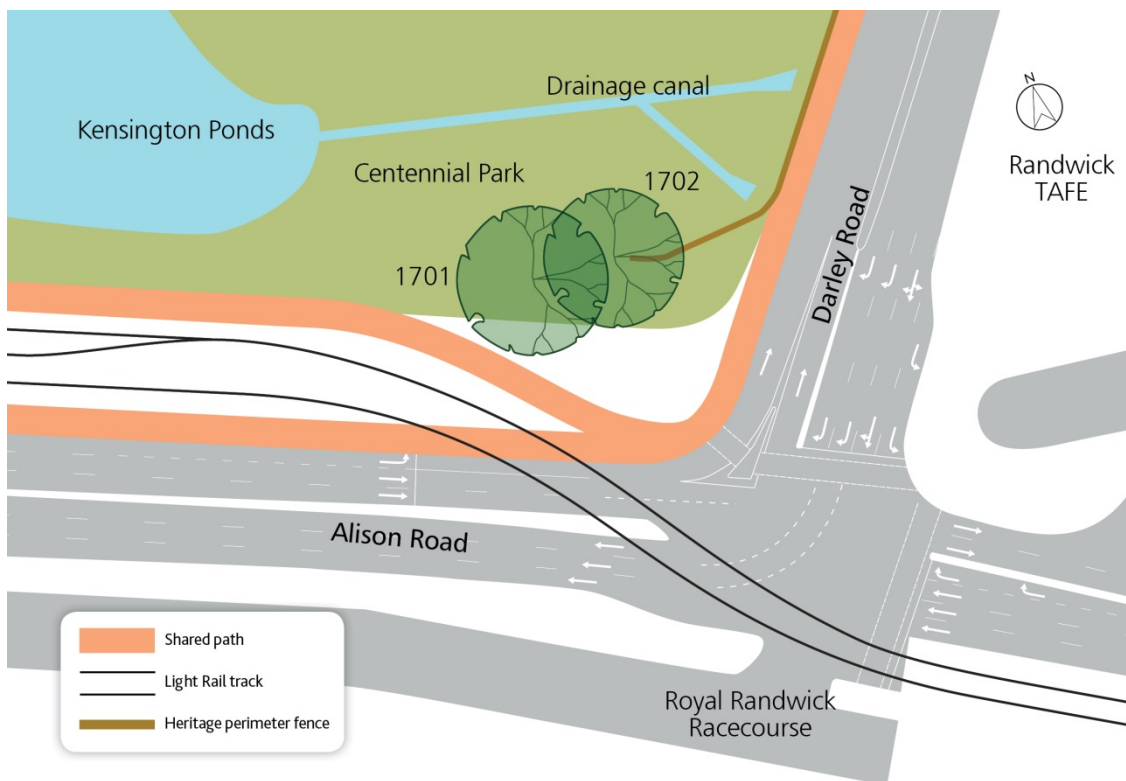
Proposed layout of Option three where the track takes a sharper turn to cross Alison Road (not to scale).
